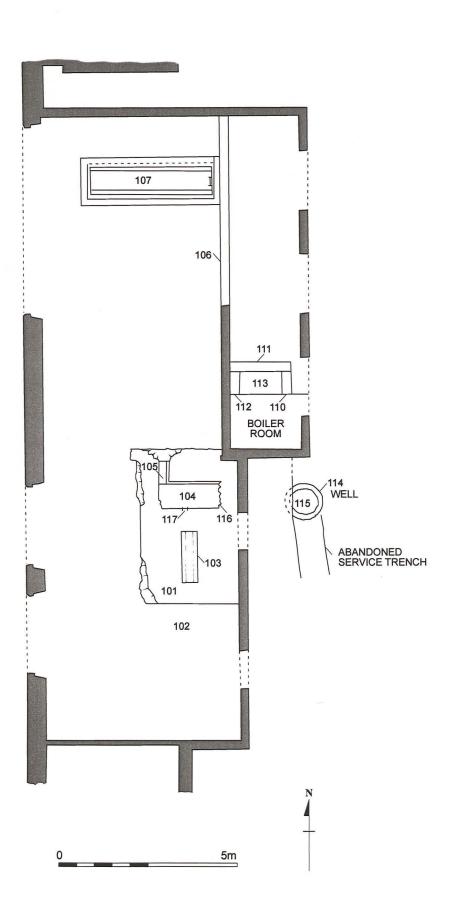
Plan of the Old Stable Block (scale: 1:100)
